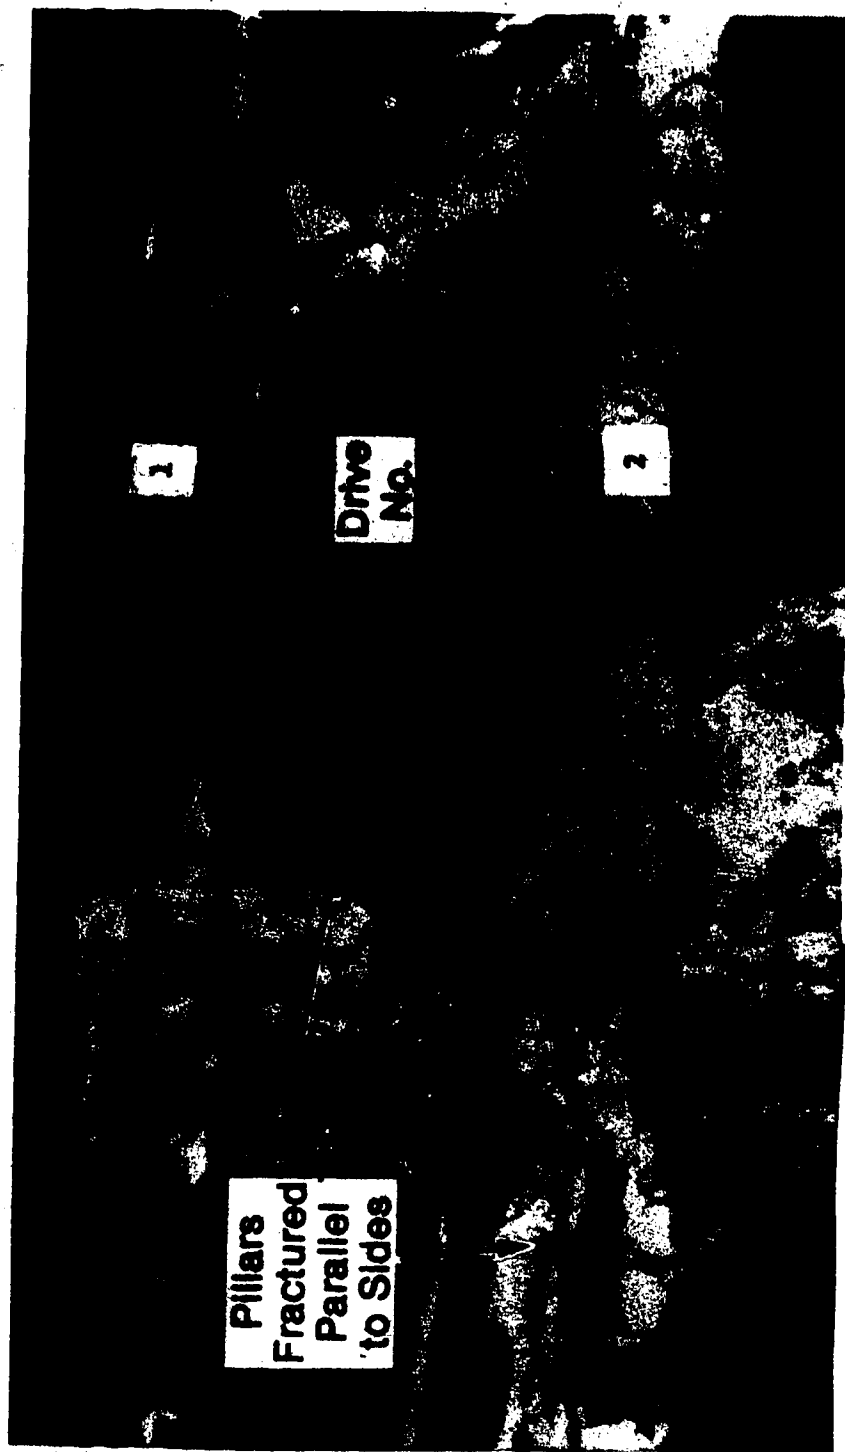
3-D MODEL (RUN 2, PLAN VIEW, UPPER SEAM) - AFTER TEST
